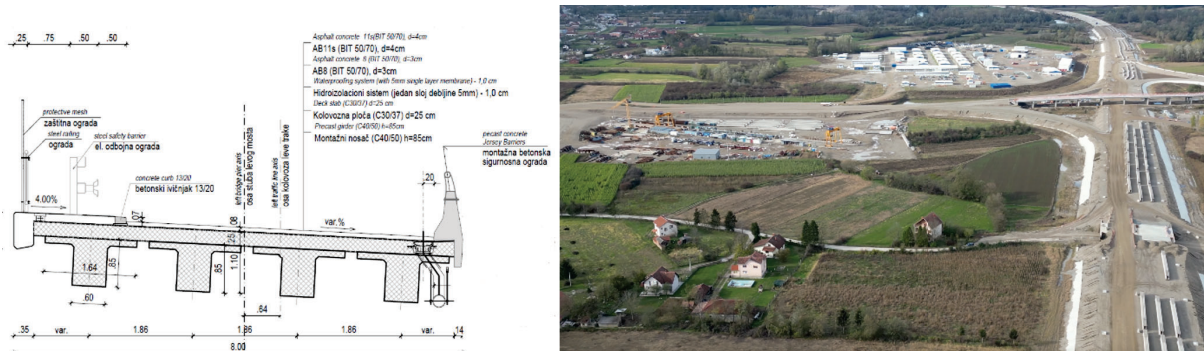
T-shaped beam bridge characteristic cross section (left) and precast concrete plant (right) [5]
